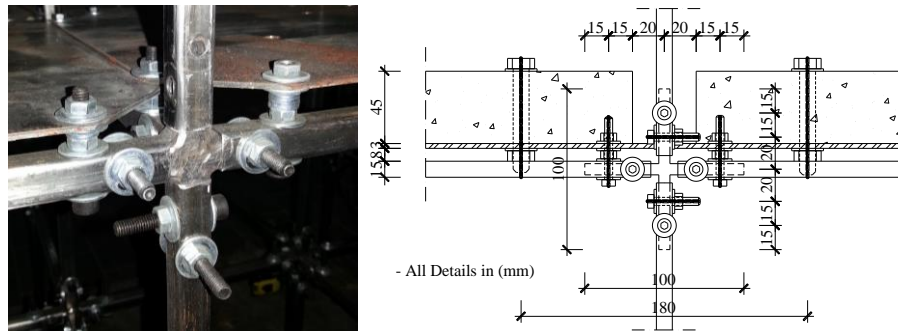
Details of beam-column joint used in multi-storey building structural model
